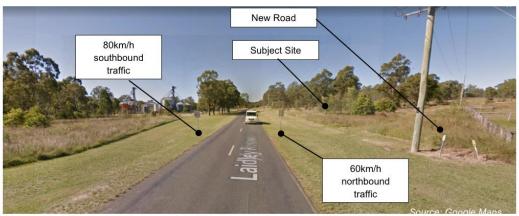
Rosewood Laidley Road adjacent to Subject Site (Facing South)
